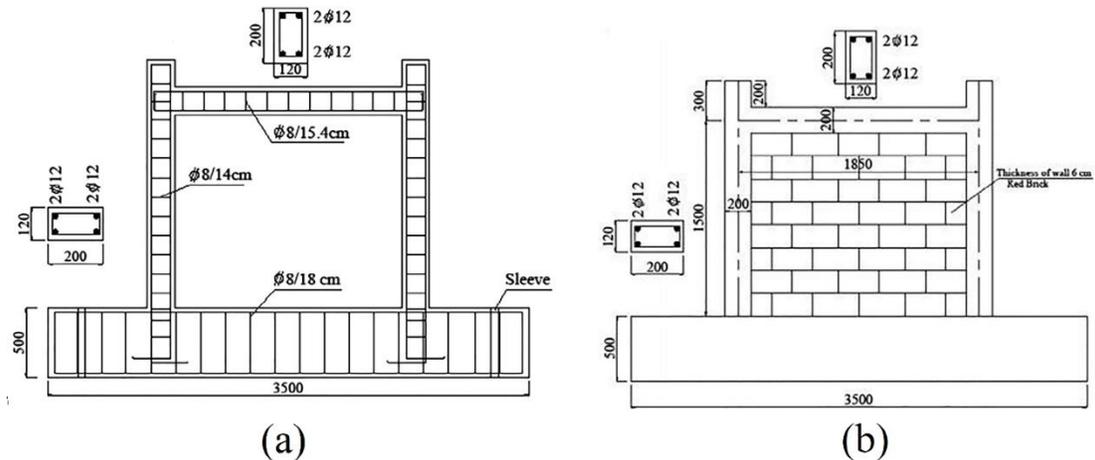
Detailing of experimental modeling (a) rebar detailing of frame (b) geometric and infill wall of frame [67].
